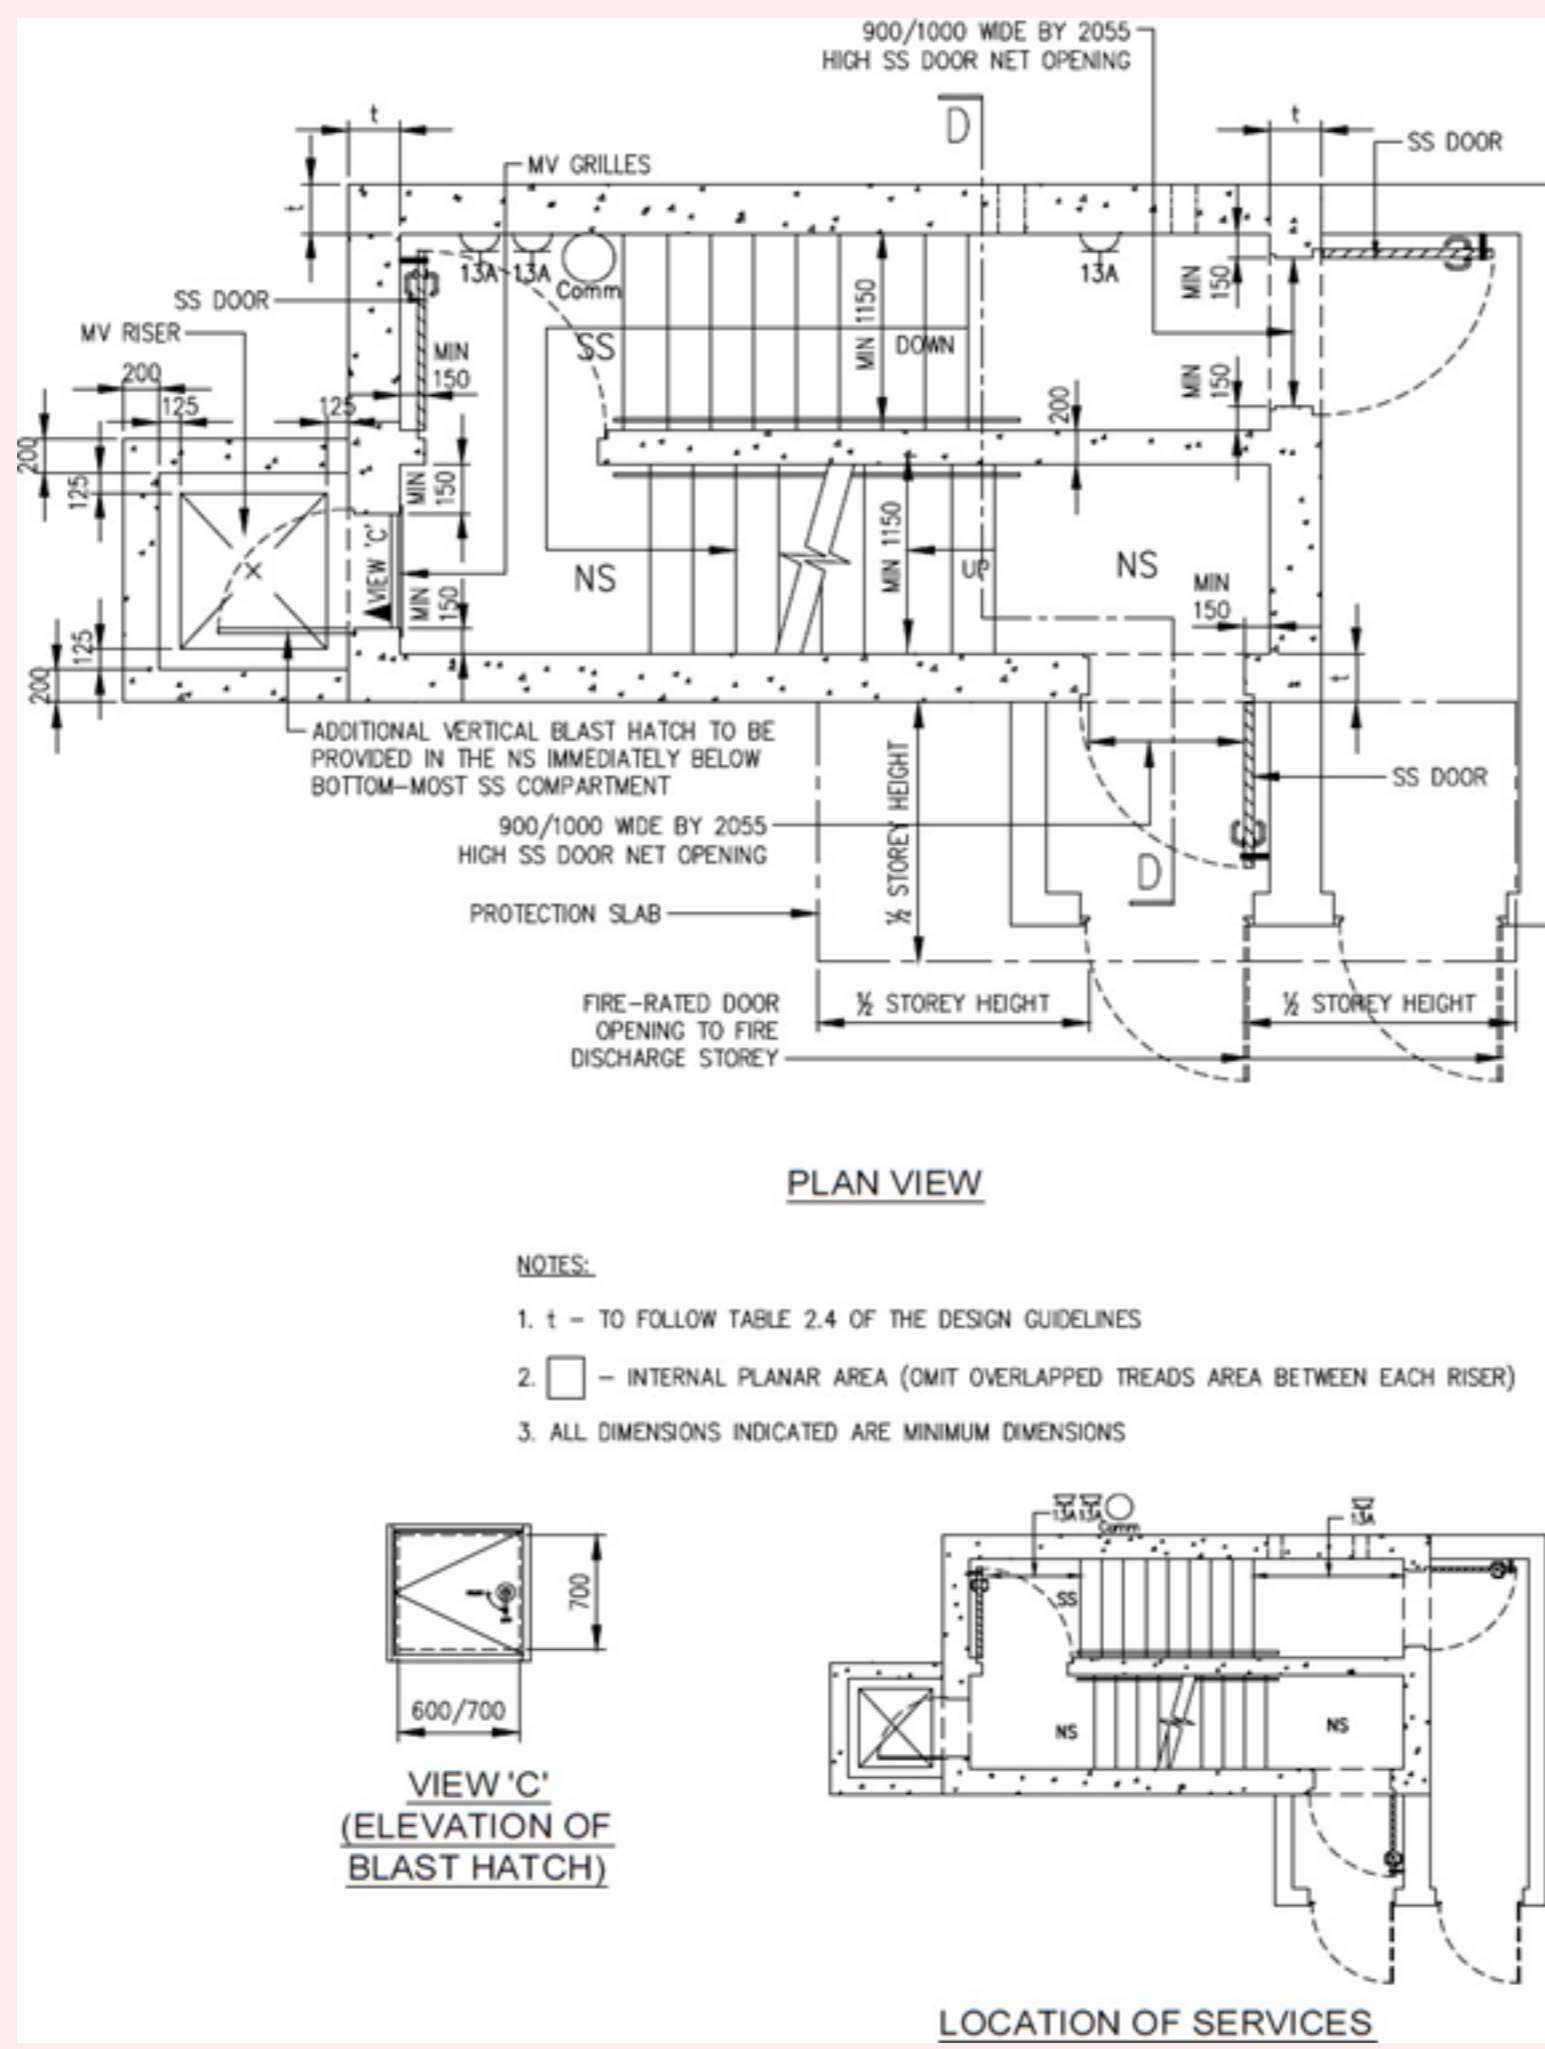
(g): DETAIL PLAN OF NS IMMEDIATELY BELOW SS AT FIRE DISCHARGE STOREY
